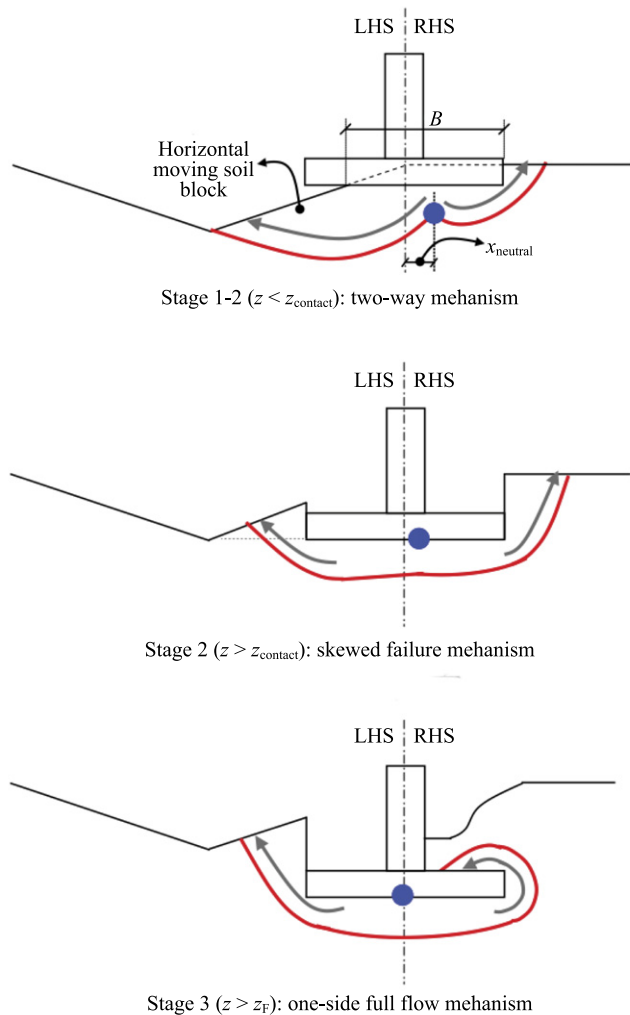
Typical failure modes of footing reinstatement near footprint.
